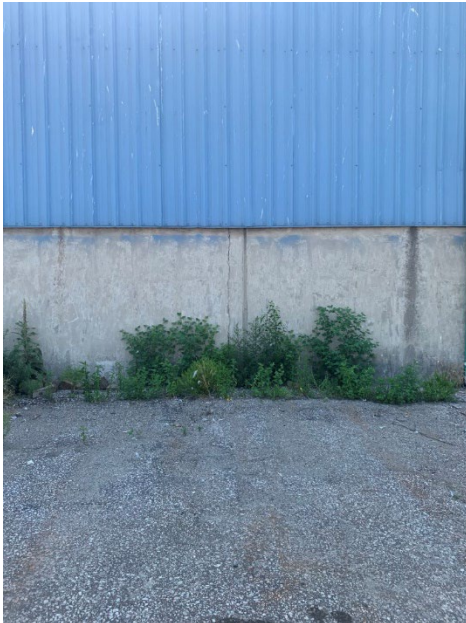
Vertical crack located approximately 6-inches away from control joint. Cracks should be routed out and repaired.
